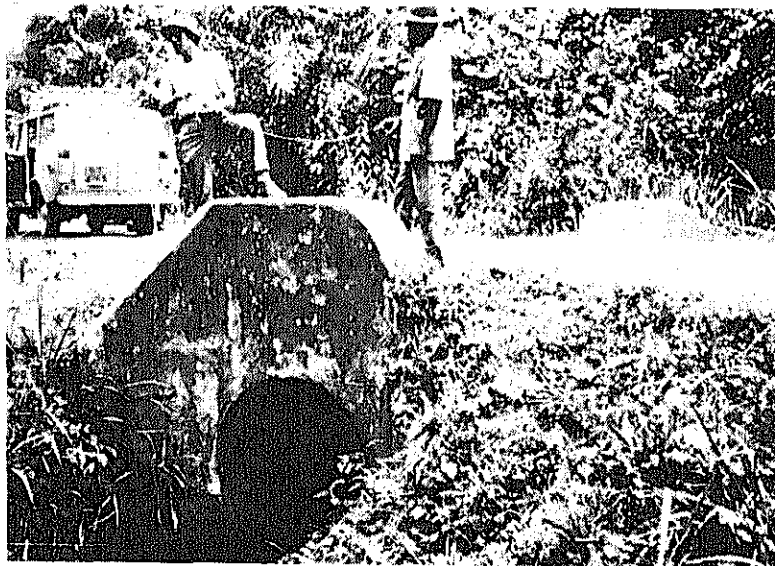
Pipe culvert at PK 69 (between Likati and Bondo)
